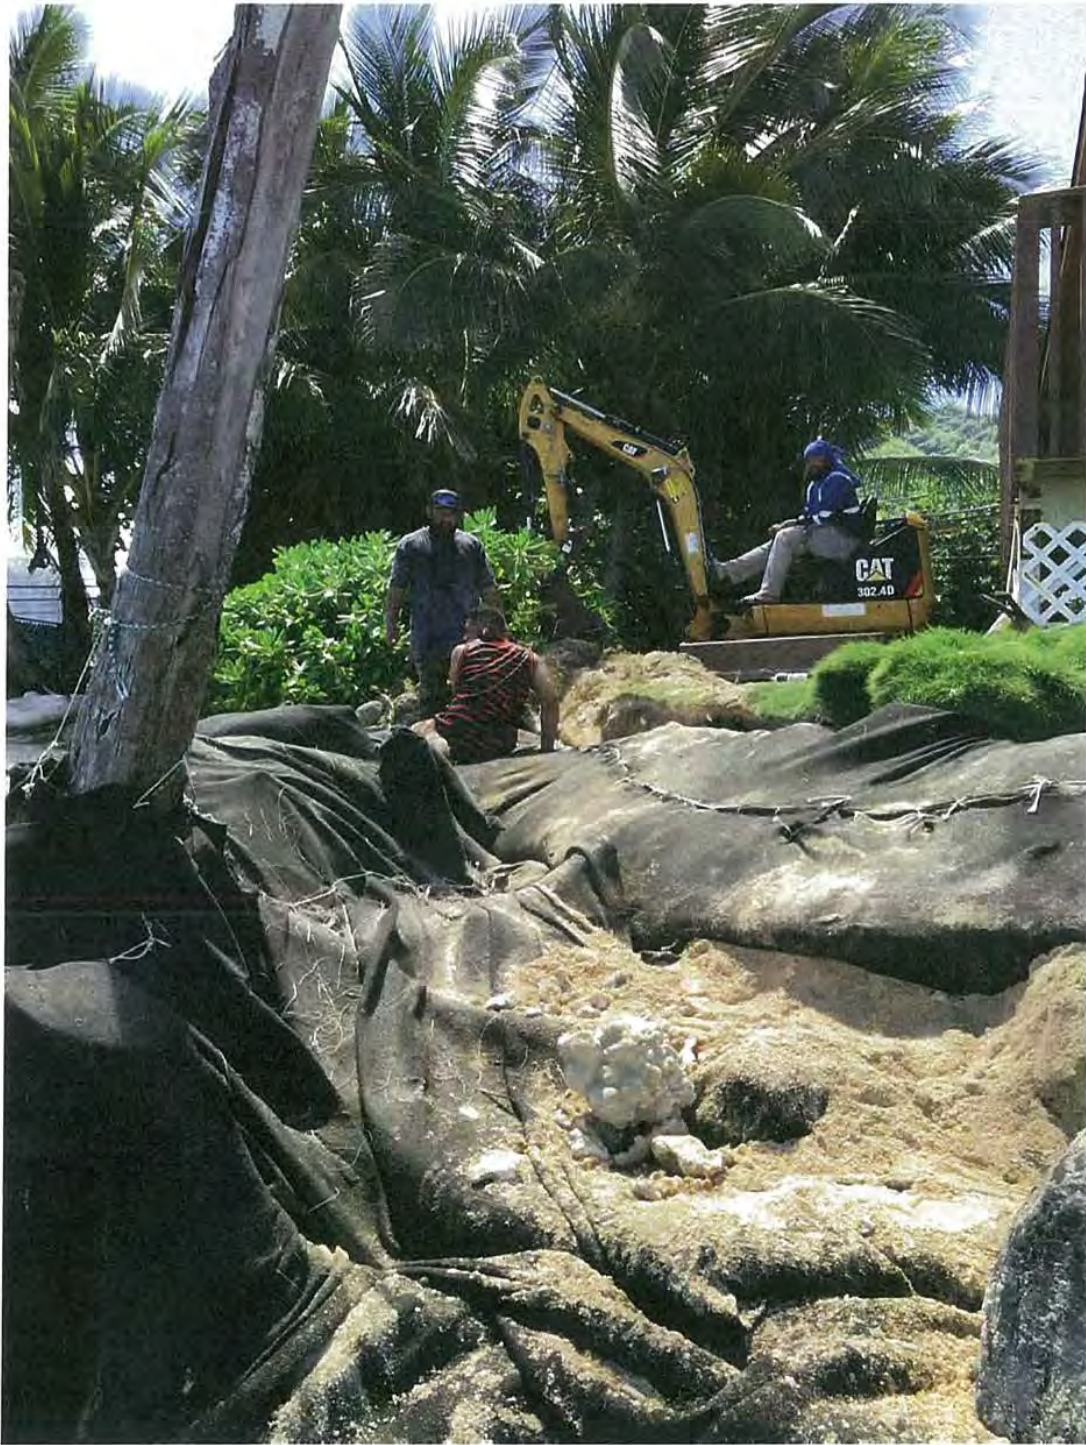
OCCL Staff Photo Taken 9/28/2022
